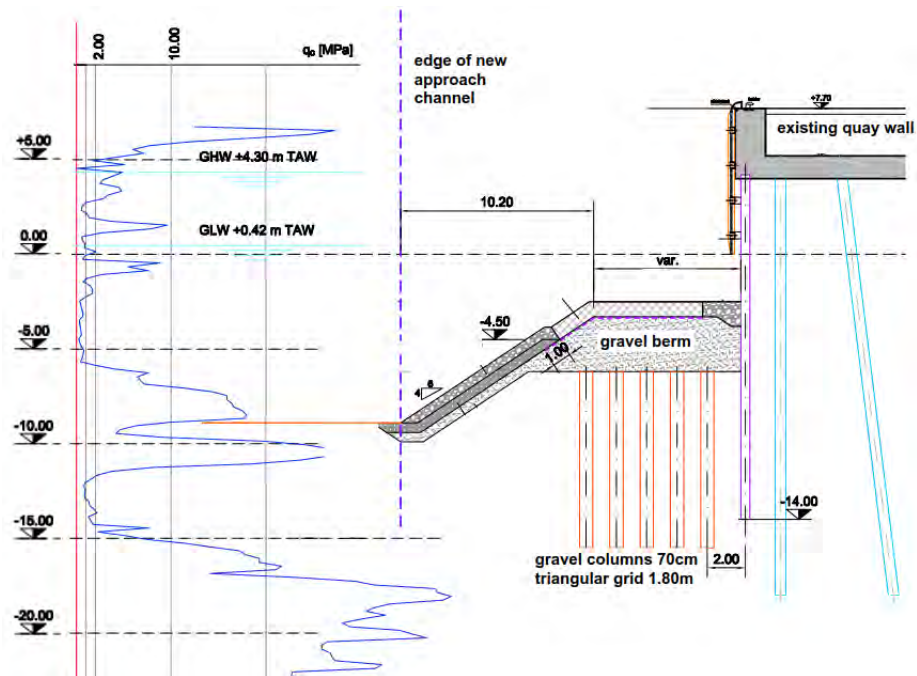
Typical cross section stabilization of quay wall with stone columns and gravel berm
